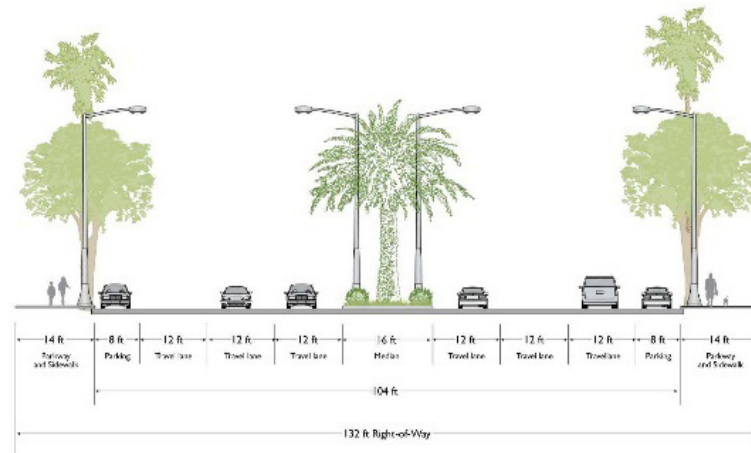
CITY OF REDLANDS GENERAL PLAN ROADWAY CROSS-SECTIONS
